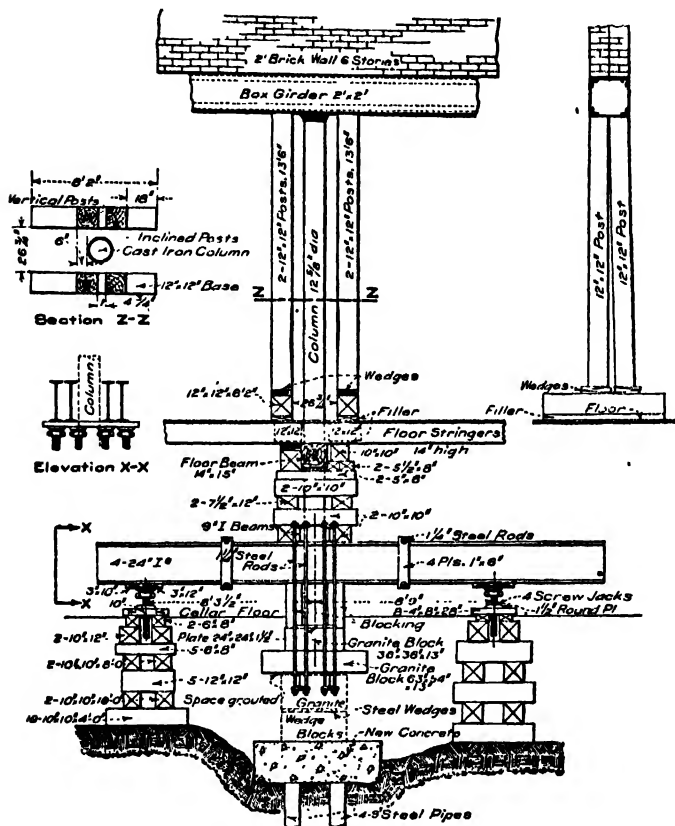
Underpinning a 300-Ton Column on Quicksand, Sargent Building, New York City.
